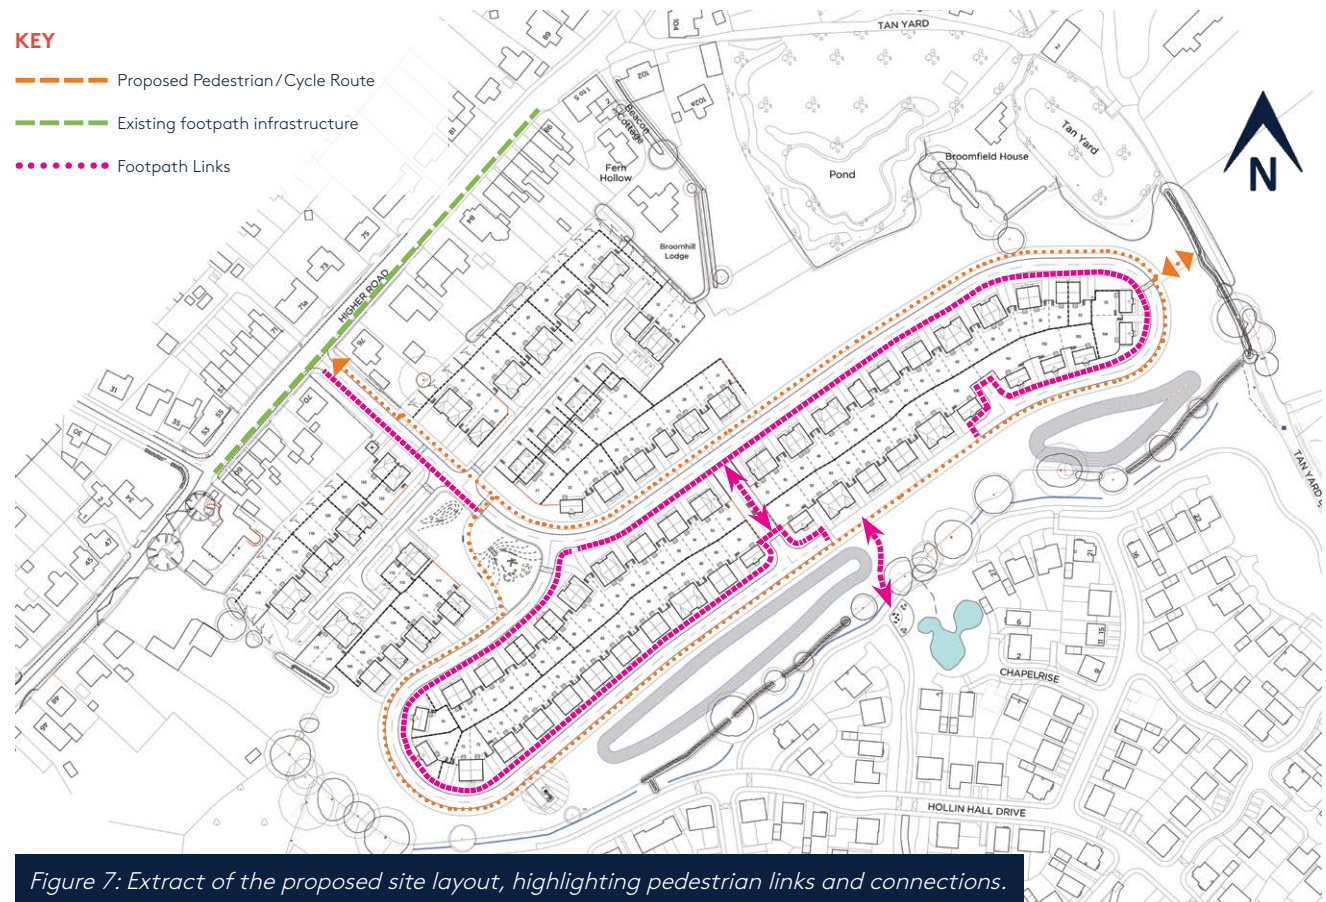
Extract of the proposed site layout, highlighting pedestrian links and connections.
